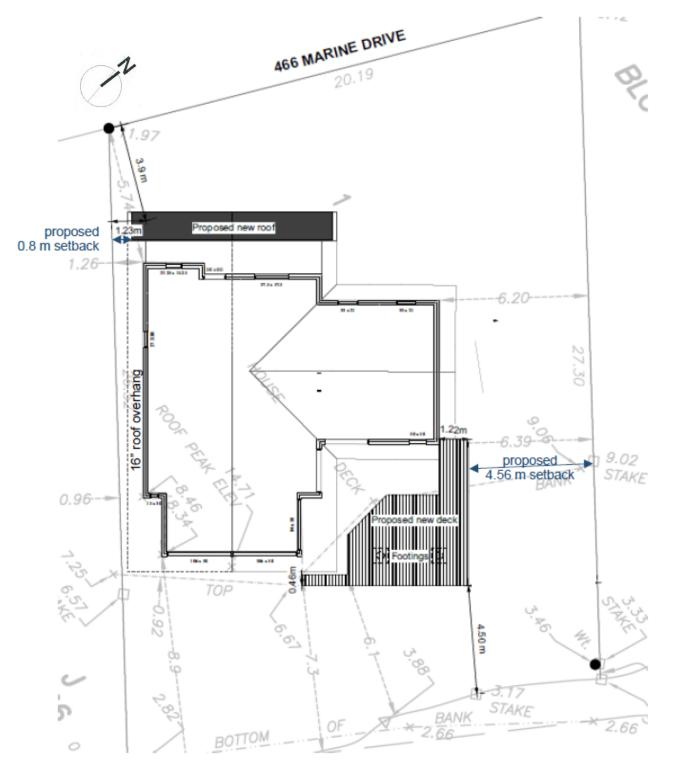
Site Plan showing location of proposed new deck and extension of existing roof over front porch.
